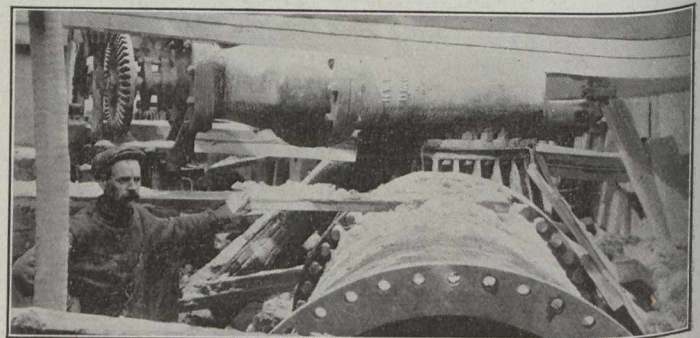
Installation of Header for the Beach Pumping Plant.
